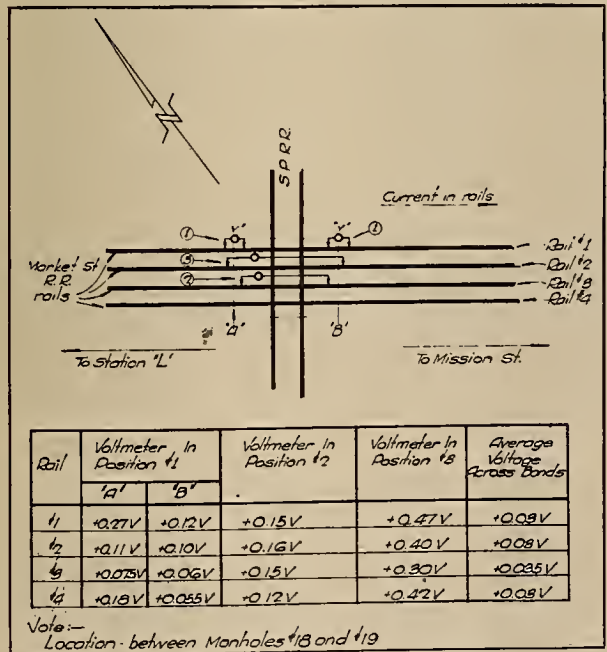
Tests of bonding of street railway rails where Southern Pacific tracks cross street railway.
